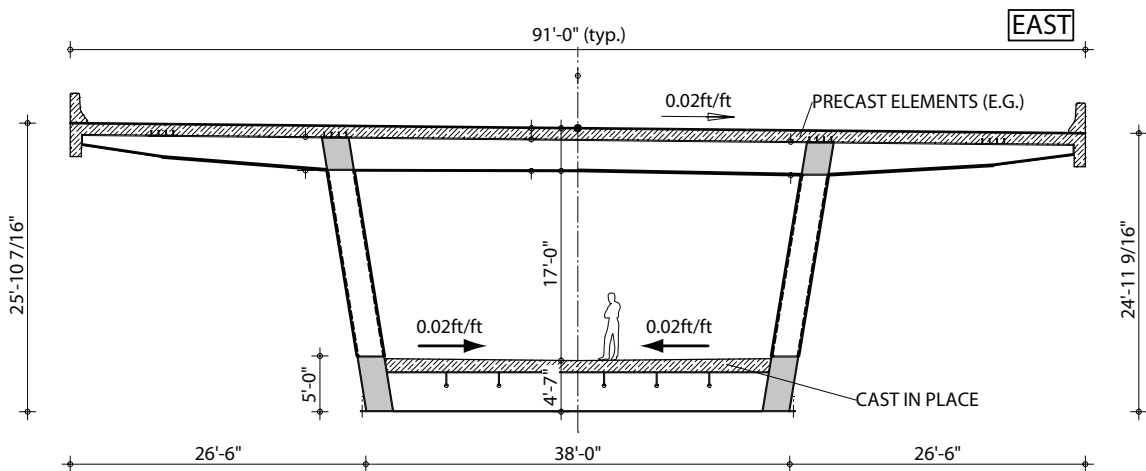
Standard Section at Midspan; Composite Deck Truss
